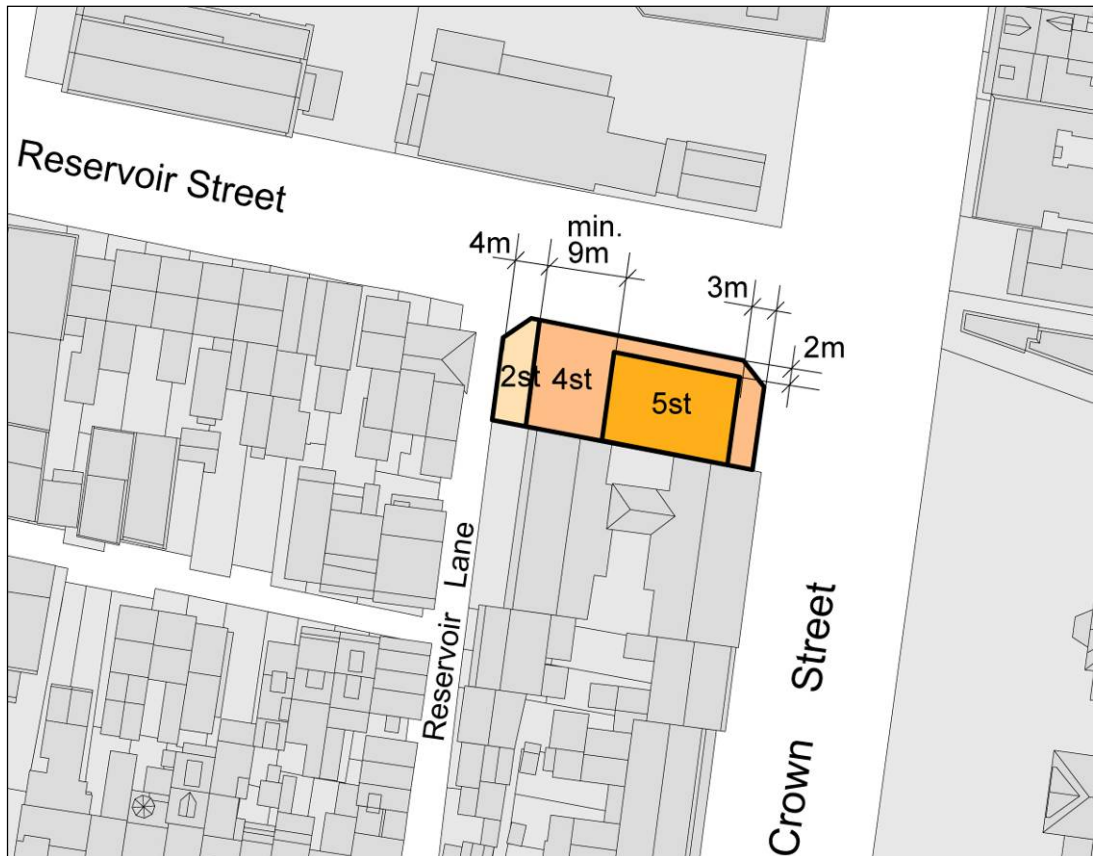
Setbacks to Reservoir Lane, Reservoir Street and Crown Street
